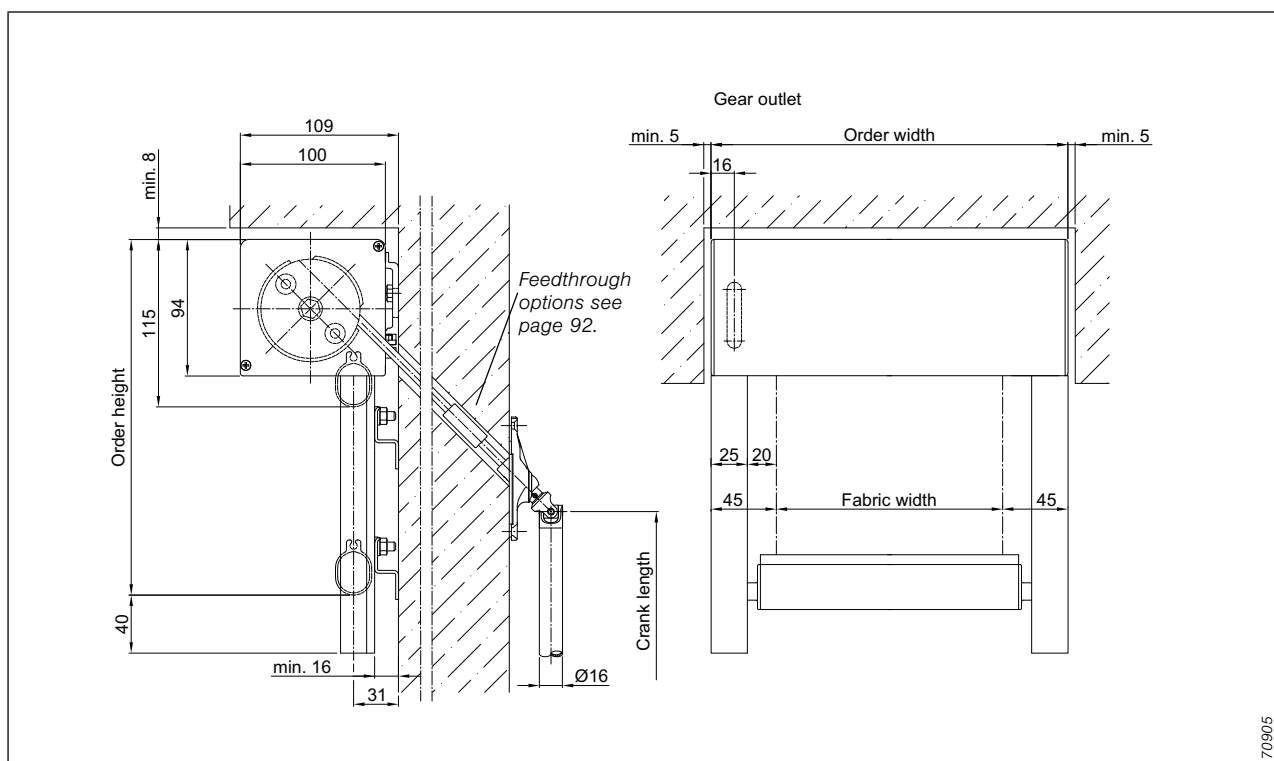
Standard model vertical awning 490 with rail guidance, crank drive, individual unit, wall installation, left rolling blind (also available as right rolling blind)
